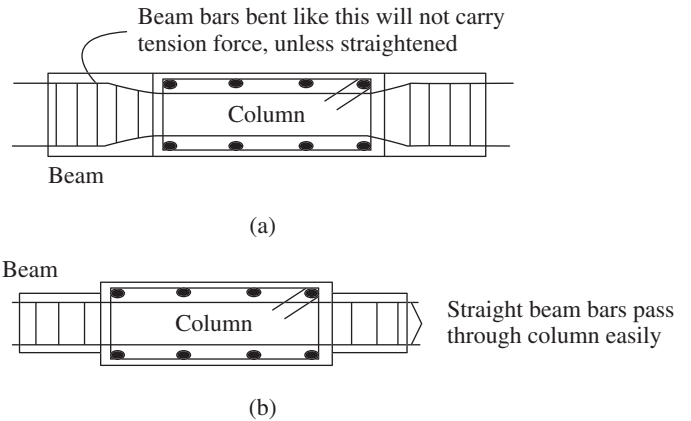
Bigger column sizes result in better reinforcement detailing (a) Beam and column of same size (b) Column width bigger than beam width
